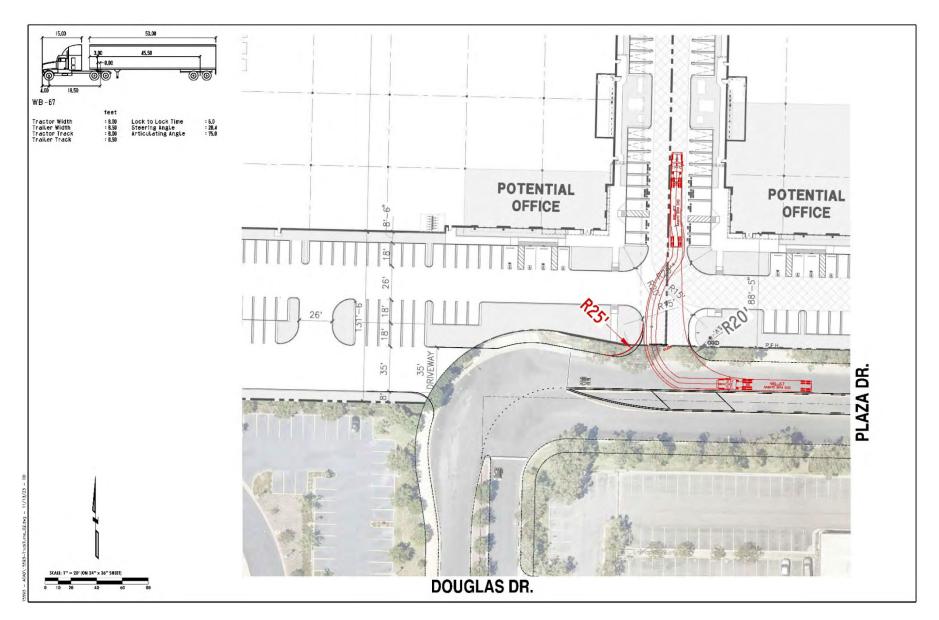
OUTBOUND TRUCK ACCESS AT DRIVEWAY 2
